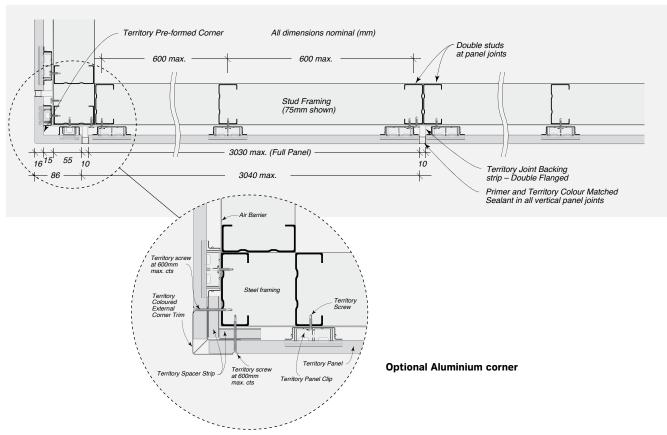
Typical Territory System Cross Section for Steel Framing – Elevation
